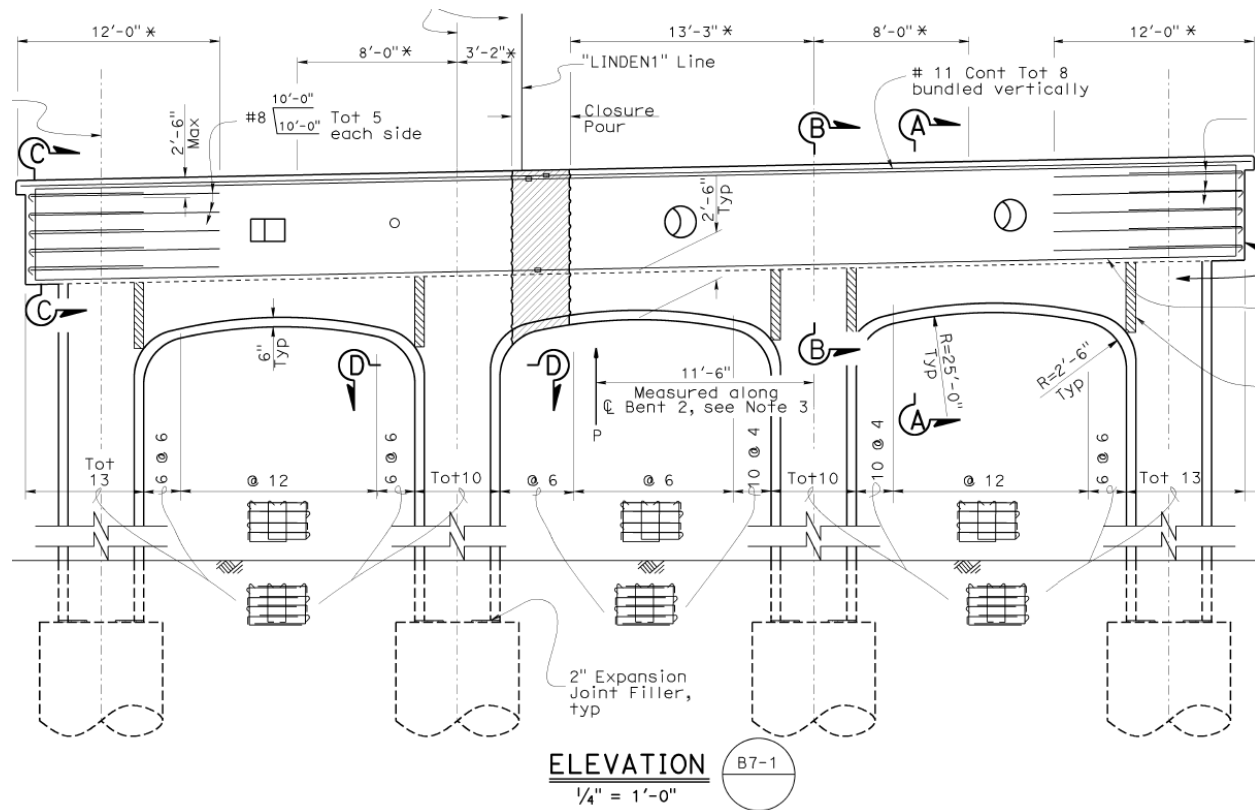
Transverse elevation view of interior bent for proposed Linden Street overcrossing replacement (after Caltrans 2016).
